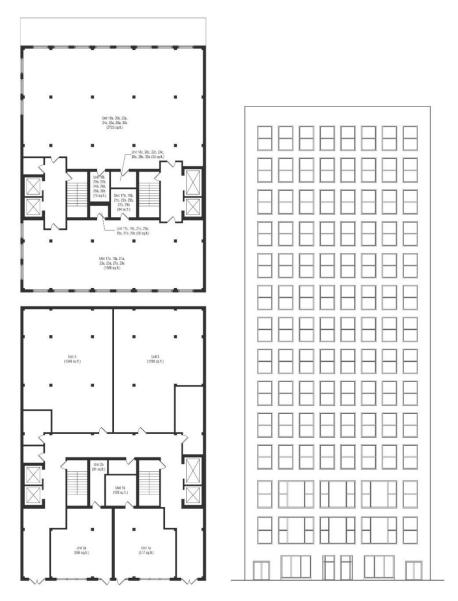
, 504, 505: (top left) Building 17, first (ground) floor (1915); (bottom left) floors 2–7 (1915); (right) street-front elevation (1984). 1'' = 32'. For plans, north is down.
